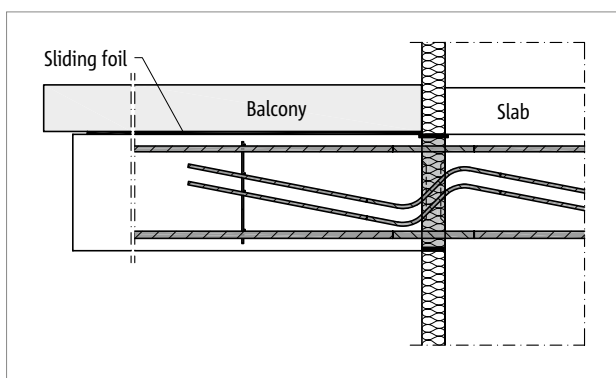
Schöck Isokorb® T type B: Balcony structure with freely cantilevered downstand beams (precast balcony)
